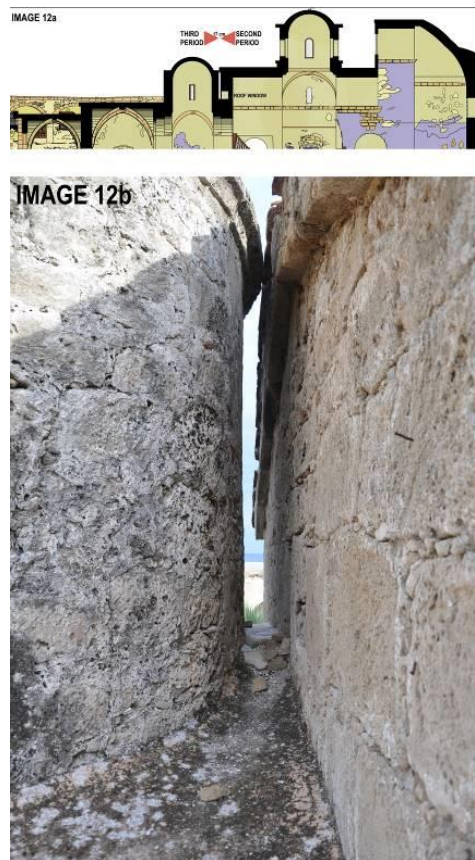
(a) Longitudinal roof section of the church building (b) image of the roof window
